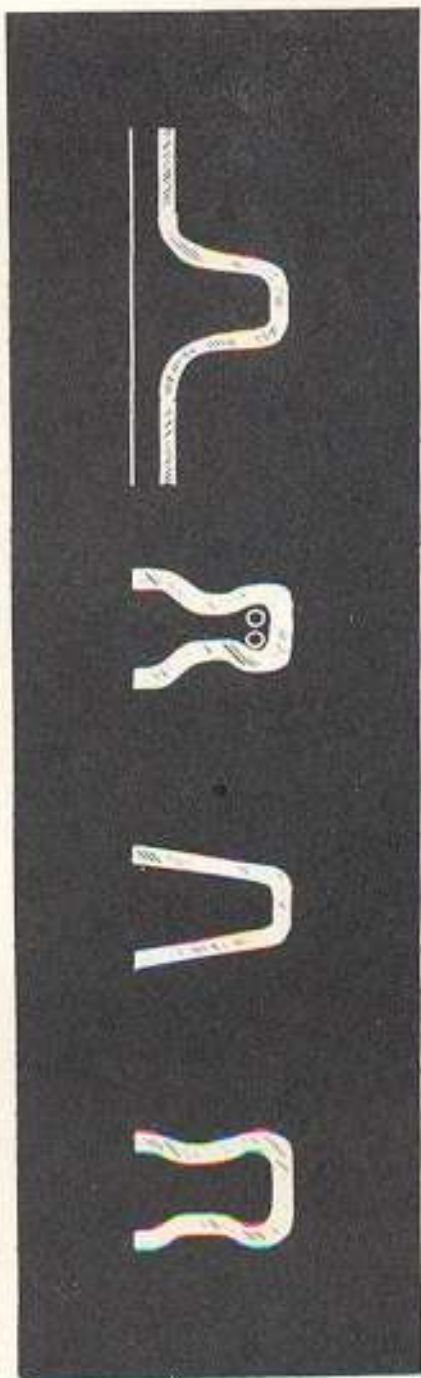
Cross-sections of prefabricated form for casting plastics structural beams
